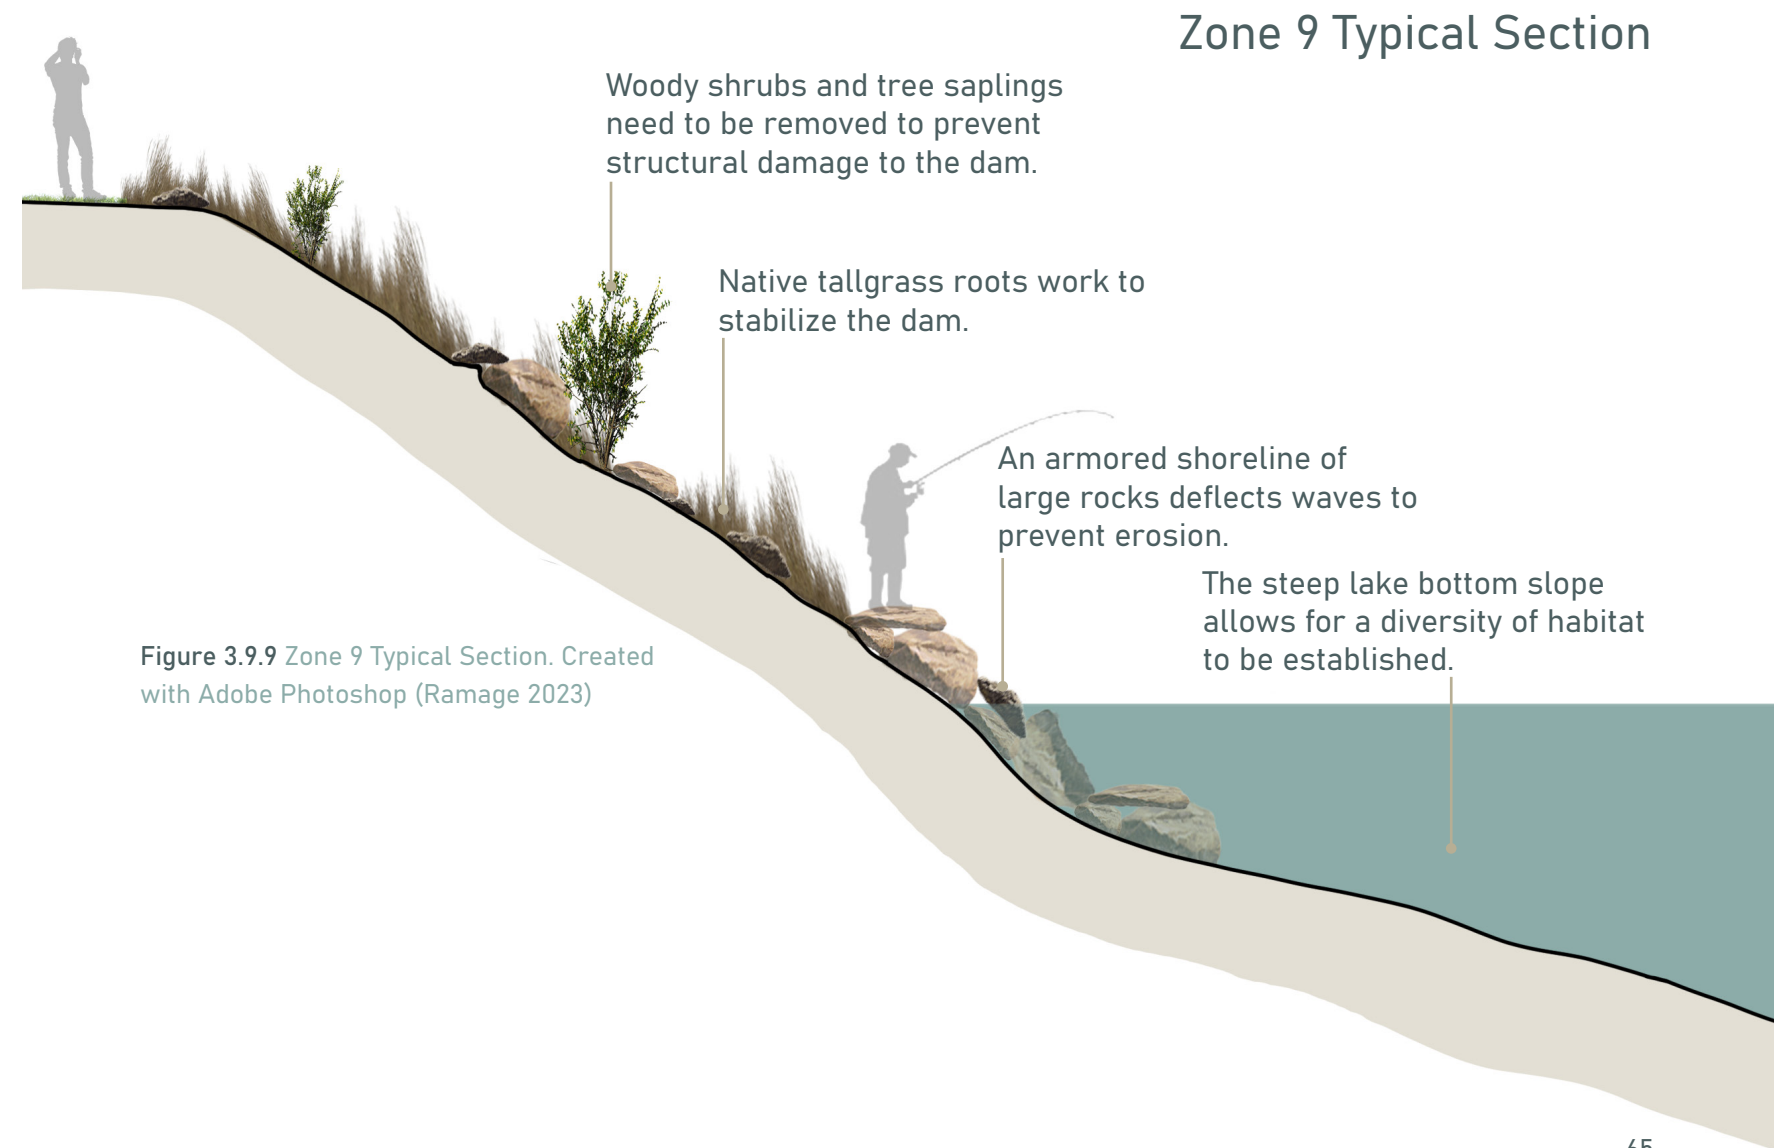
Zone 9 Typical Section. Created with Adobe Photoshop (Ramage 2023)
